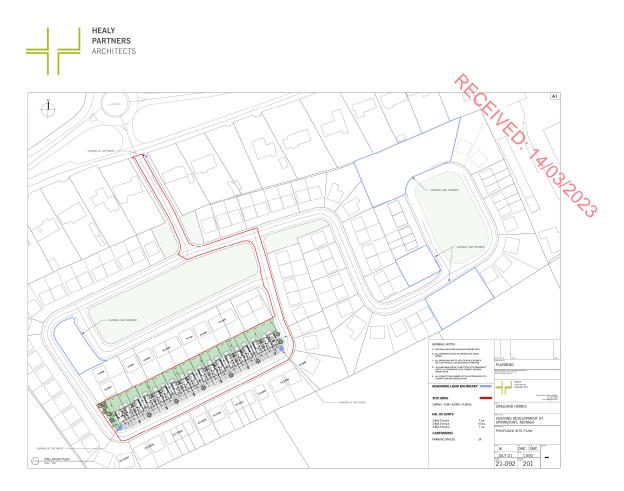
Proposed Site Layout for Phase 2/Plot D – Up date Site plan
